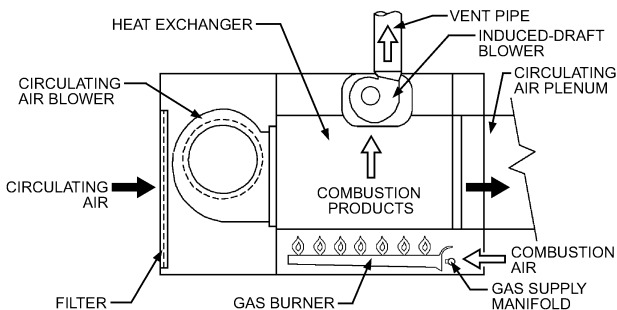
Horizontal Category I Furnace with Induced-Draft Blower
